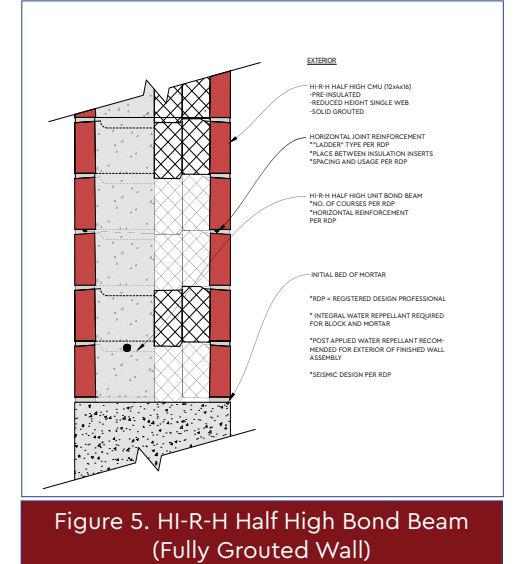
HI-R-H Half High Bond Beam (Fully Grouted Wall)
